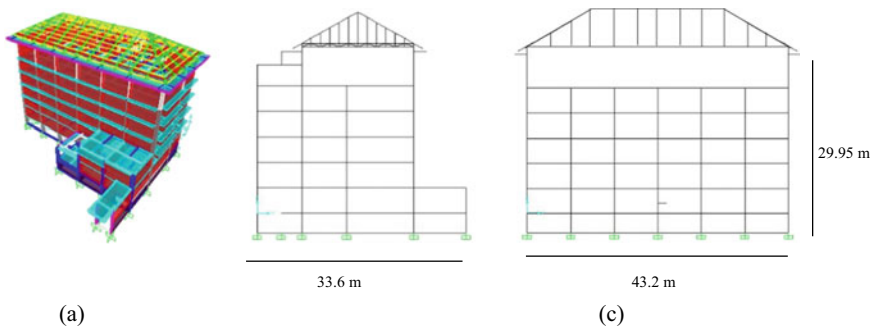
a 3D image of building, b lateral section, c longitudinal section
